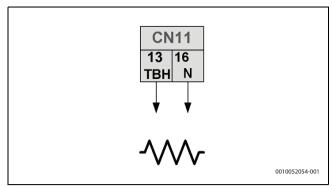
Booster heater cable HMI configuration, type 2 control signal [TBH] DHW tank booster heater
